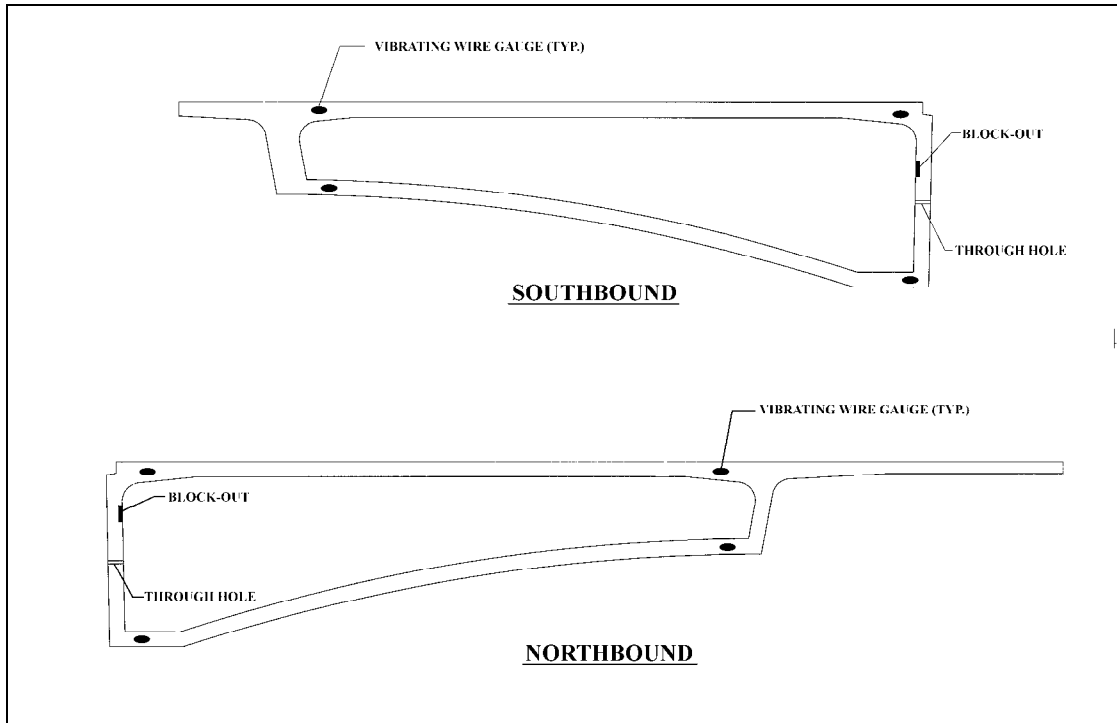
Roadway Segments Type-II Gauge Locations (Modified IRIB Specifications and Construction Plans)
